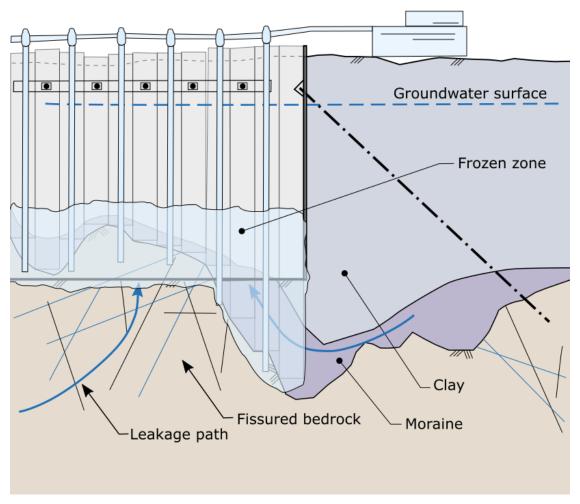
Artificial ground freezing in transition zone between sheet pile and bedrock surface.
